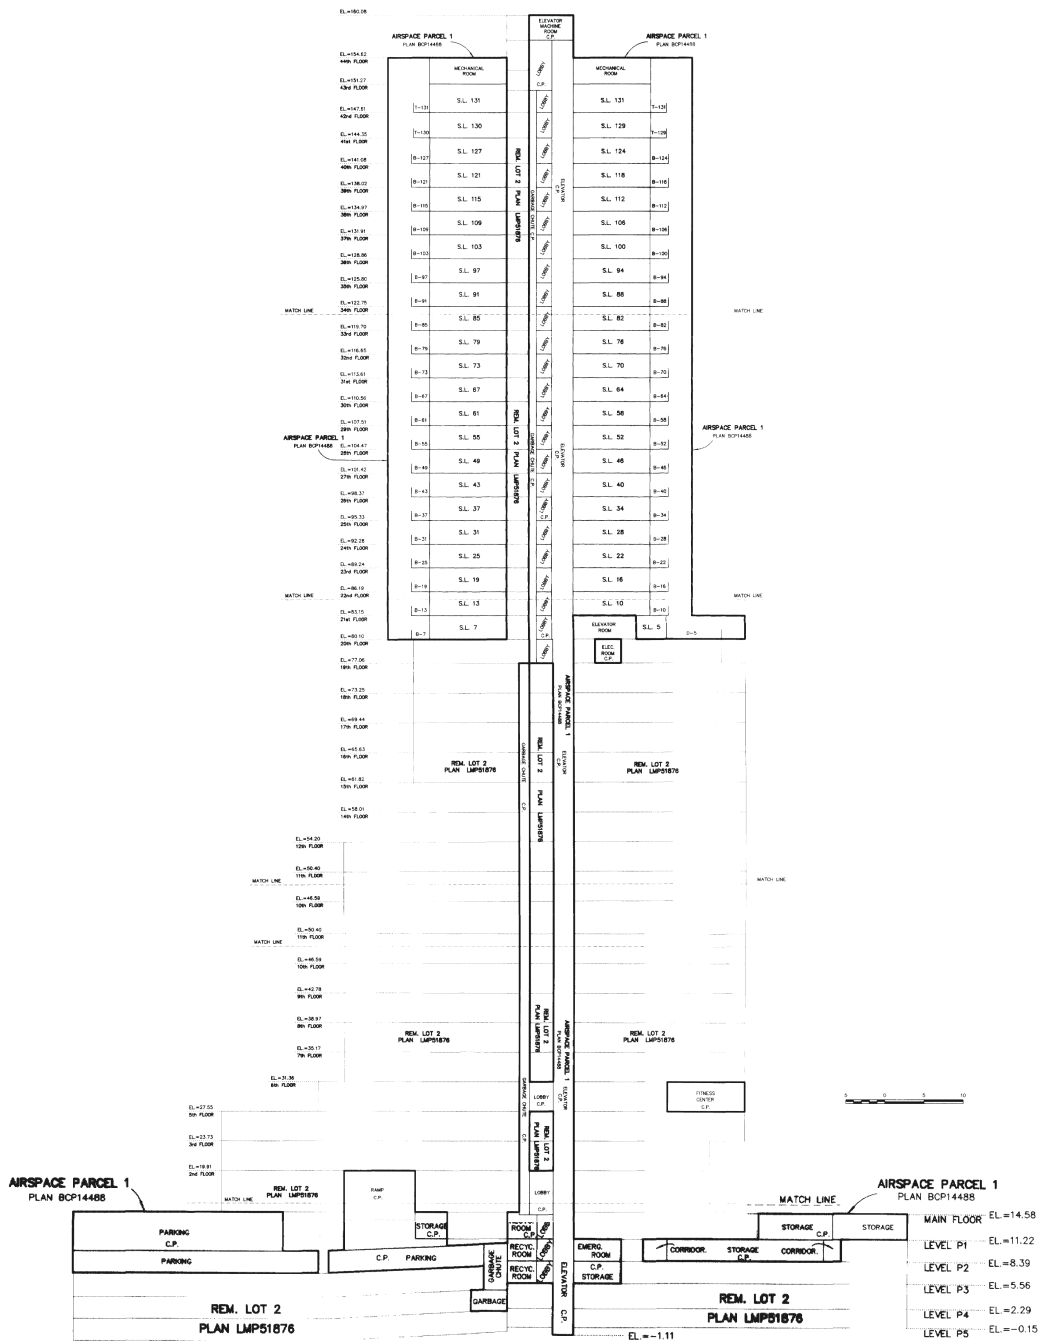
Compilation of sheets 53-57 from Strata Plan BCS1233 creating the strata lots (apartments in the upper tower) and common property (elevator shaft, fitness centre on level five, ground level lobby, and underground parking area) within Air Space Parcel 1 in Rogers Tower. (Source: Land Title & Survey Authority. Compilation by Eric Leinberger.)
